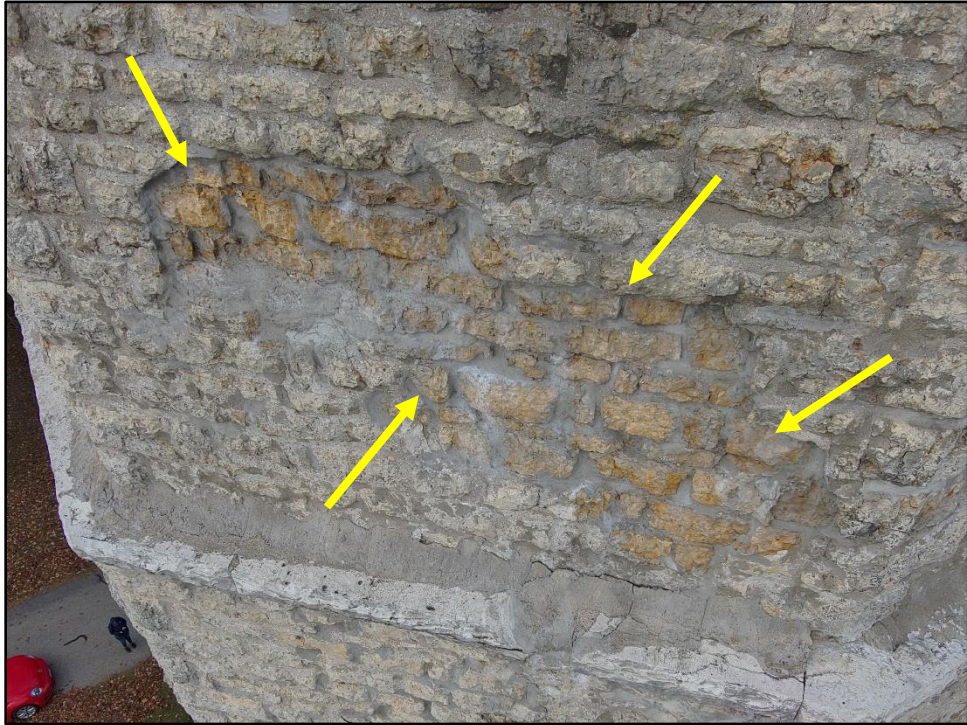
Area of spalled stone – top tier, southeast elevation
